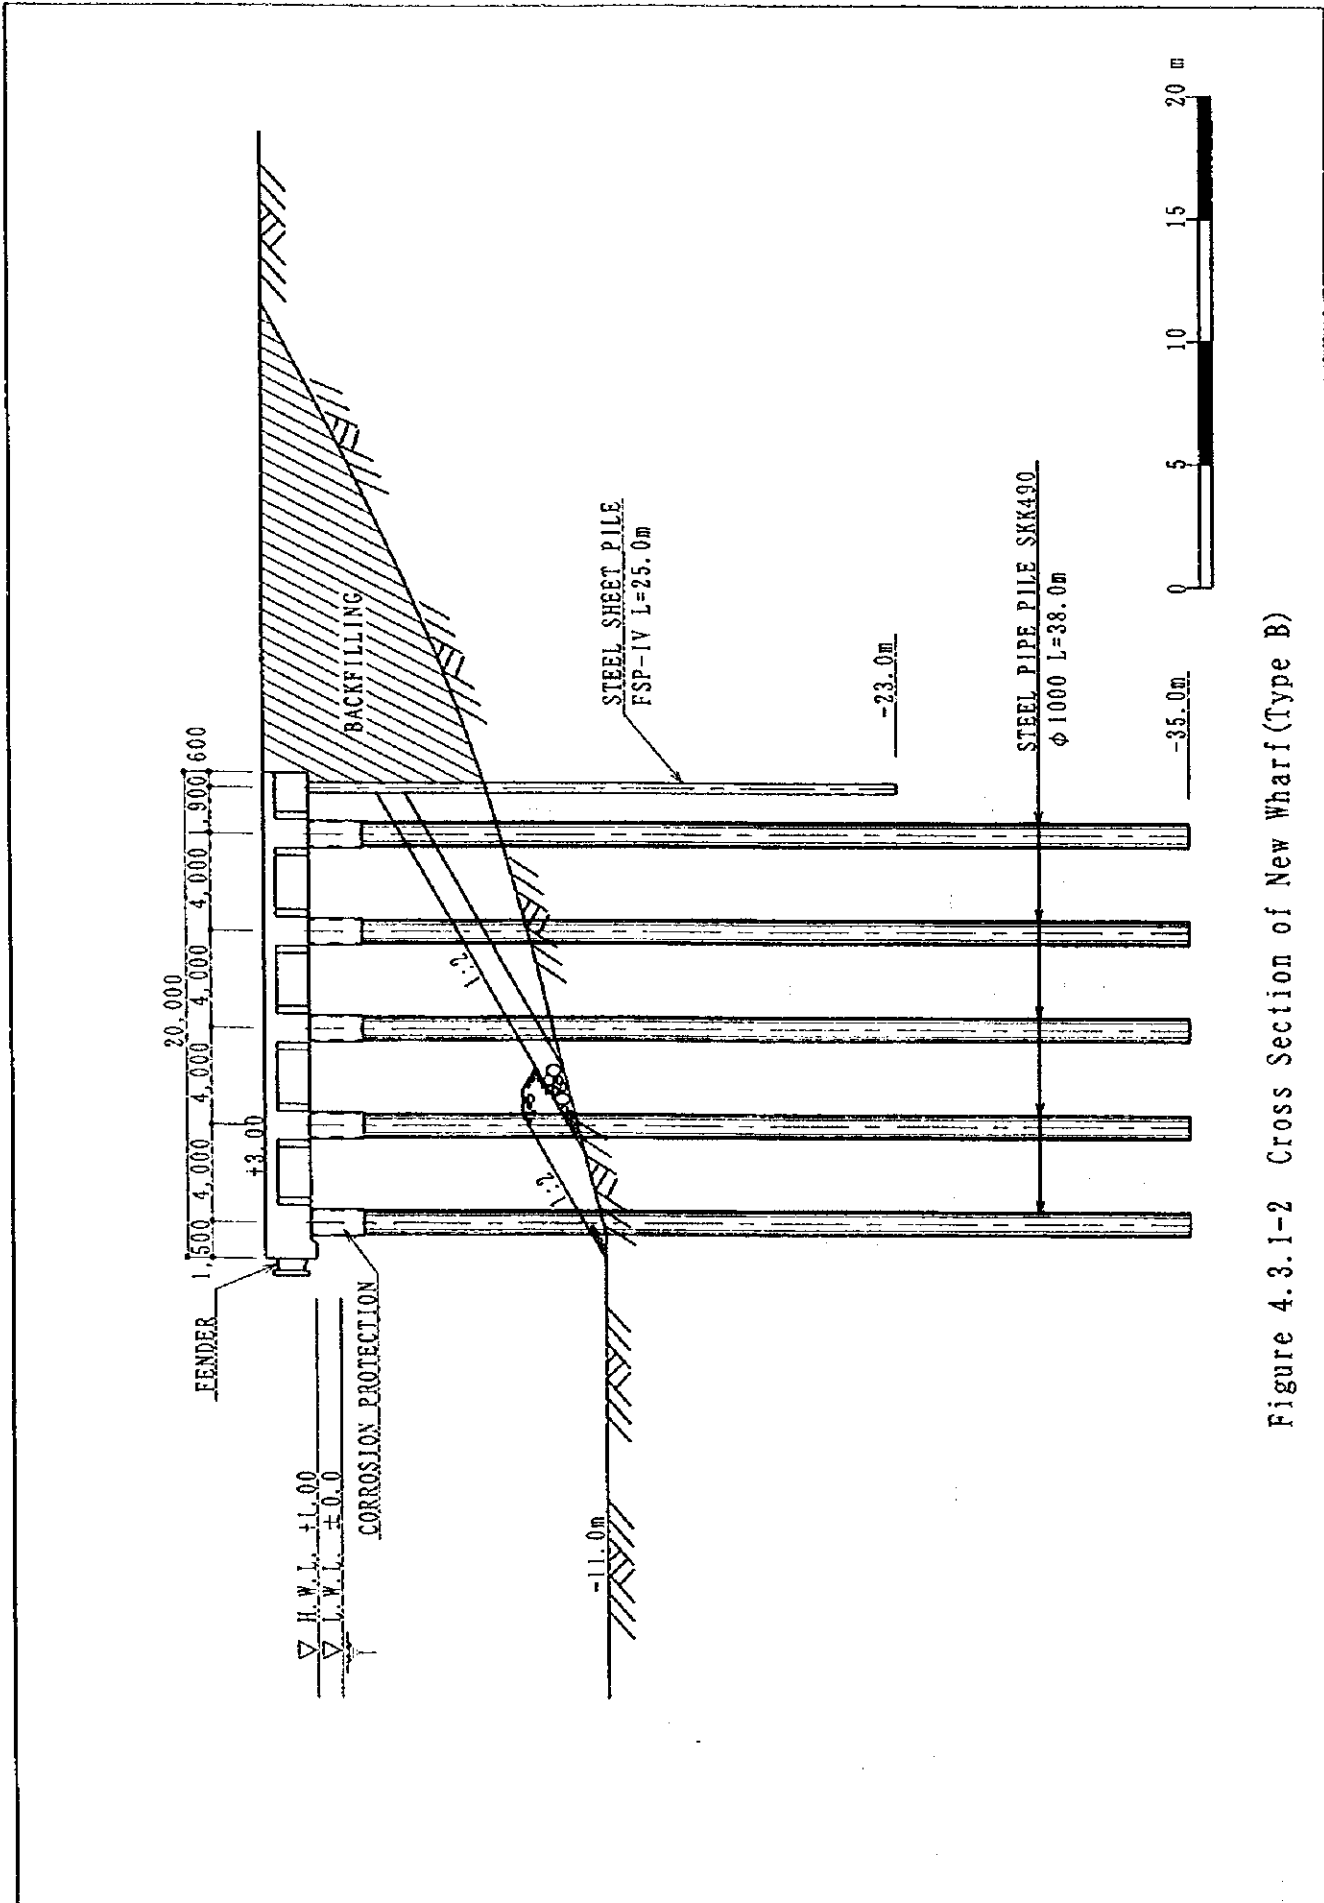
Cross Section of New Wharf (Type B)
